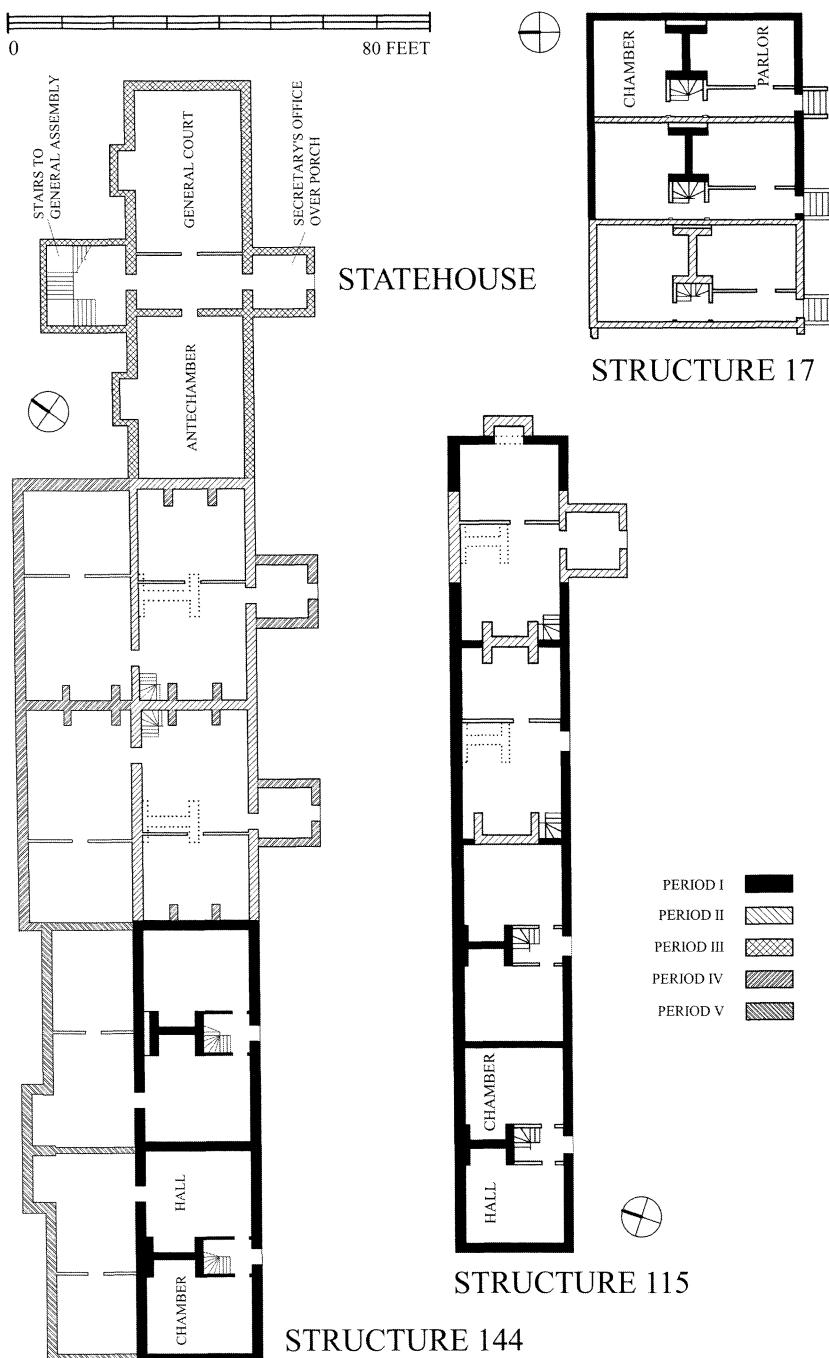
Jamestown rowhouses: Structure 17, built and enlarged 1663–1676; Structure 115, built 1663, partially reconditioned ca. 1681; Structure 144, built, enlarged, and rebuilt 1663–ca. 1694. Statehouse added to east end 1664/1665. (Drawing by Cary Carson and Willie Graham)
